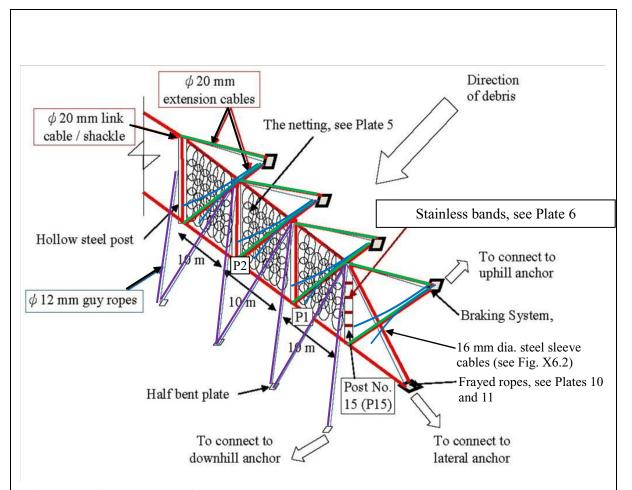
Sketch Plan of Boulder Fence at Posts Nos. P1 and P15
